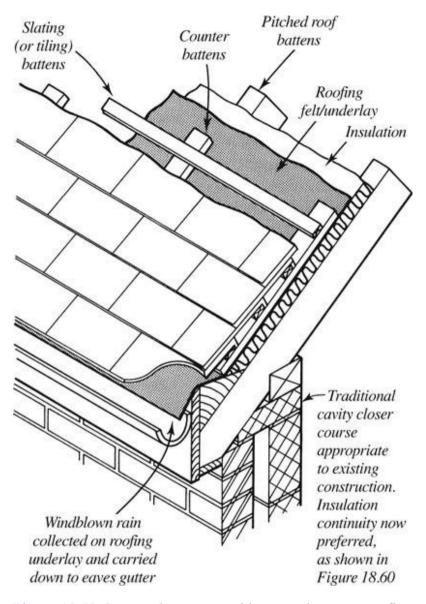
Counter battens provide a gap between roofing felt and slating battens (see also Fig. 6.6).
